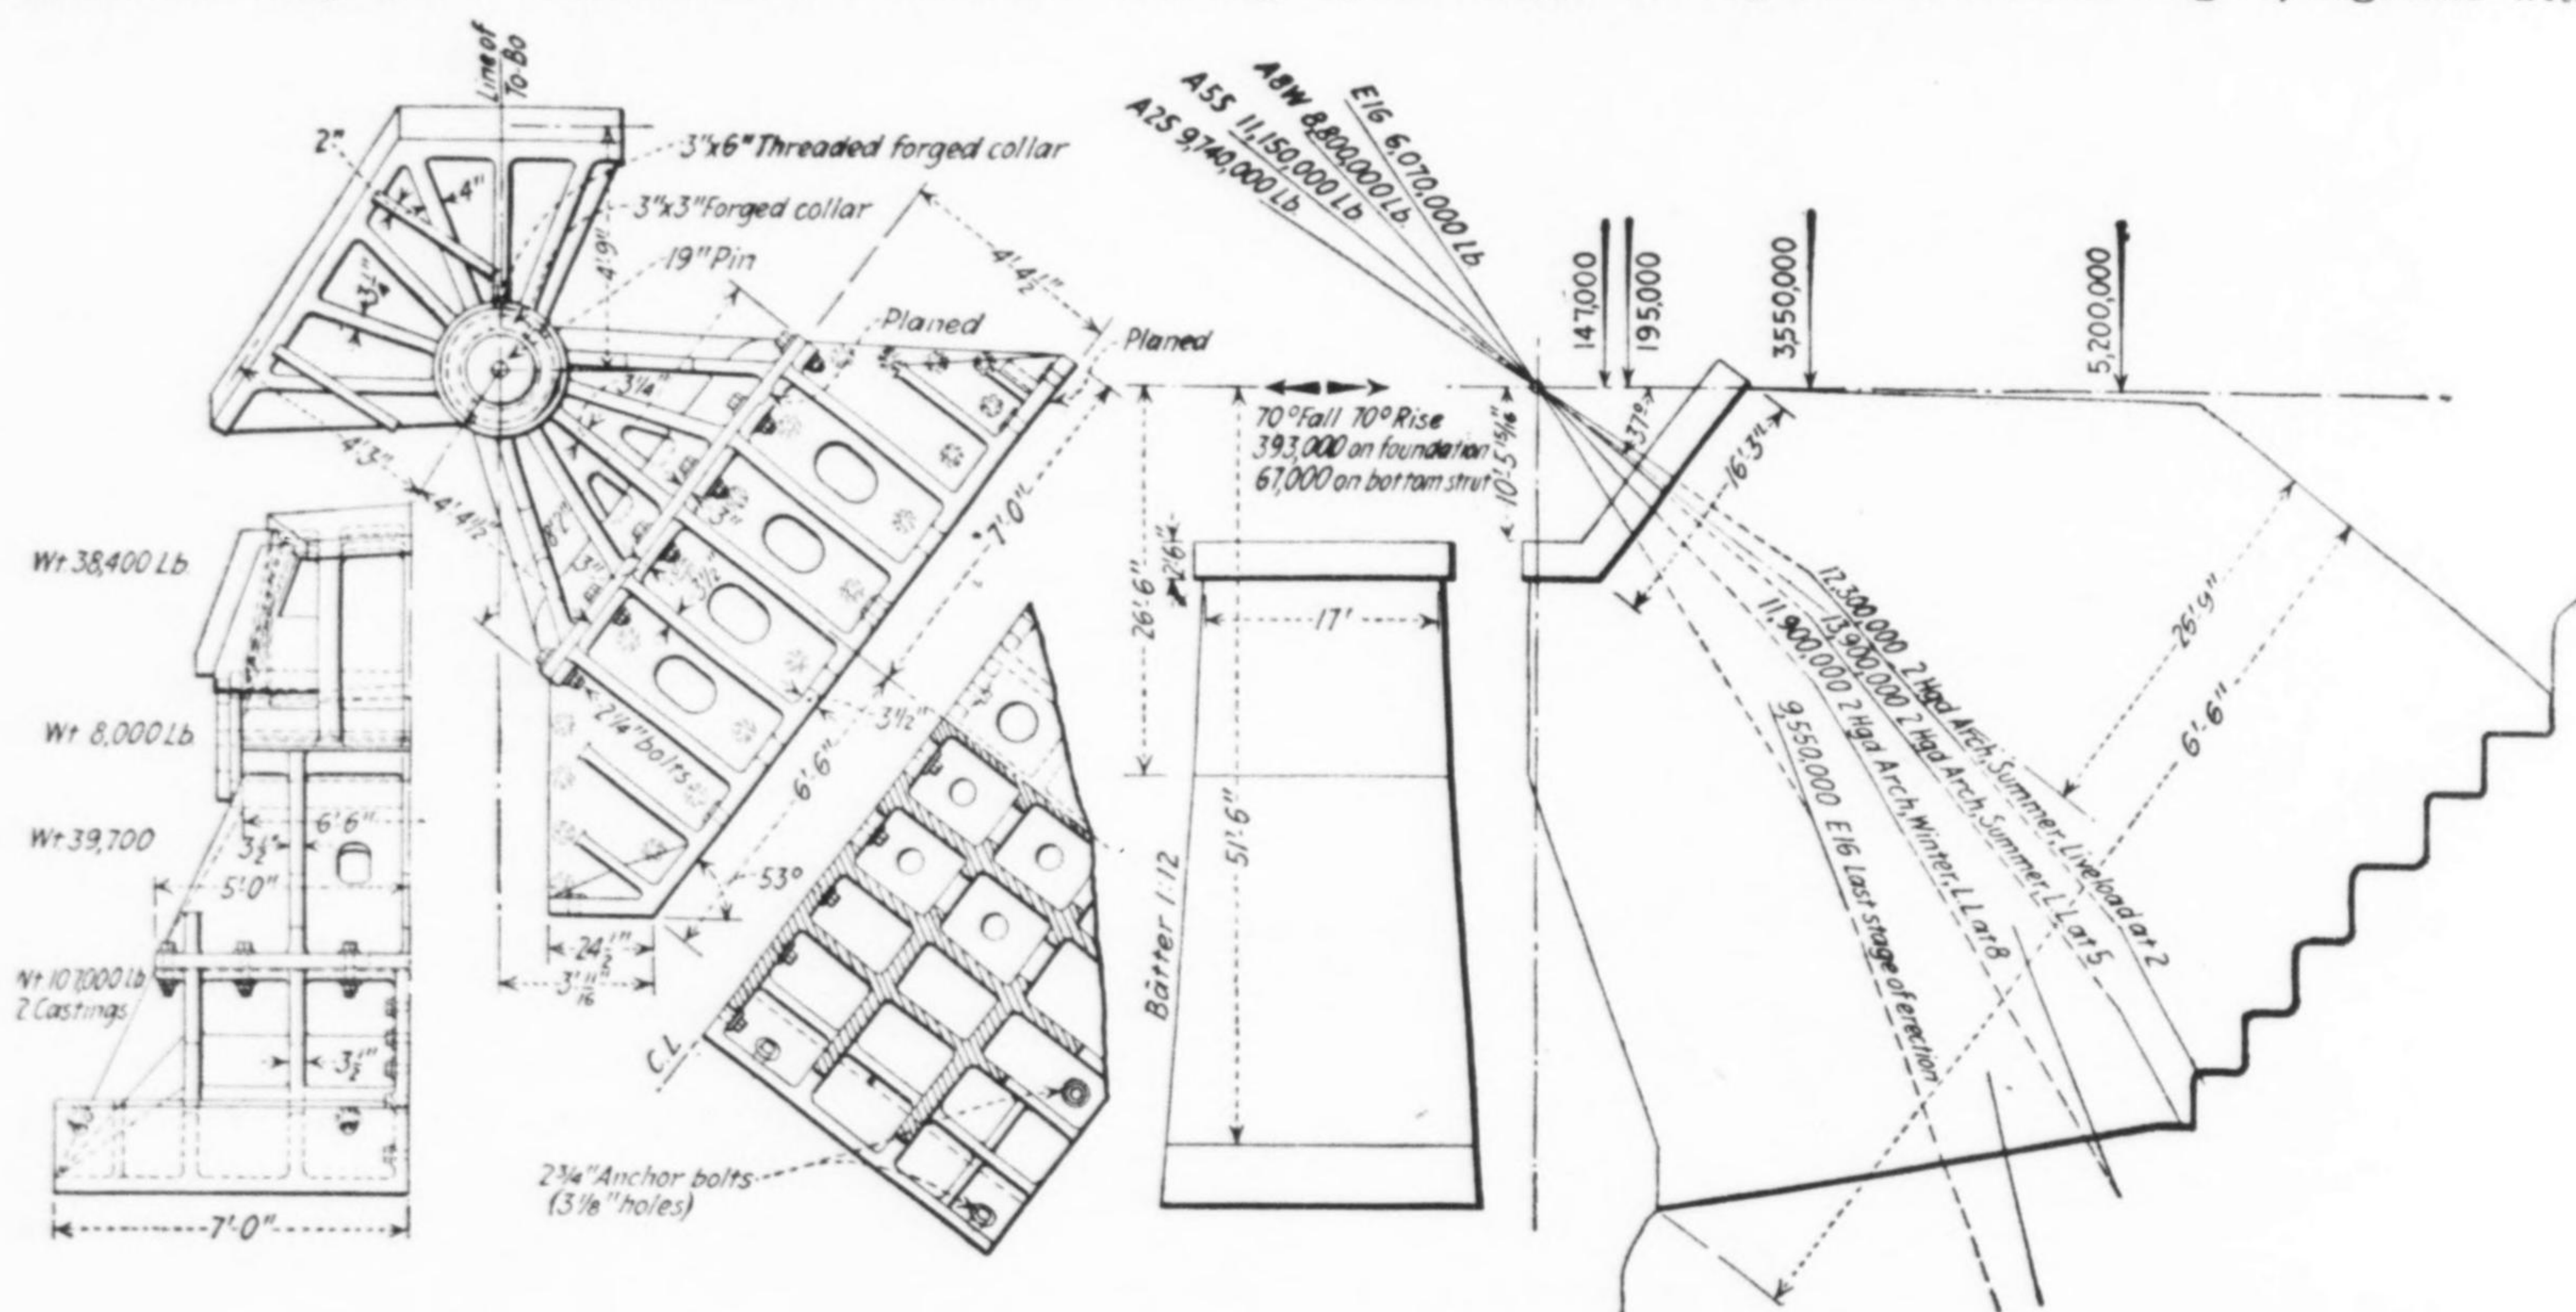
END SHOE, CONCRETE PIER AND REACTIONS
